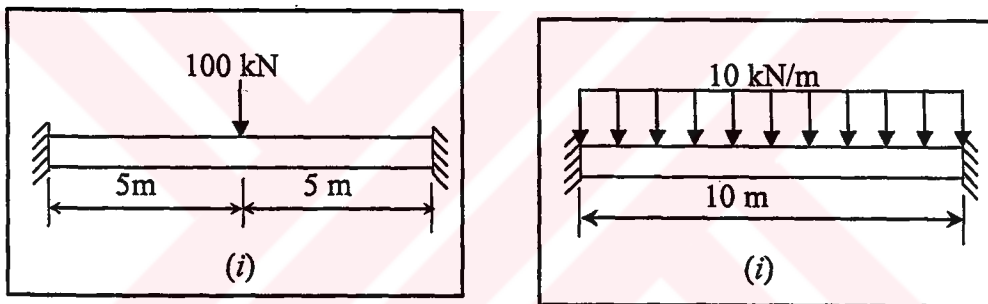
Dimensions and loadings of beams (i) point load, (ii) distributed load
